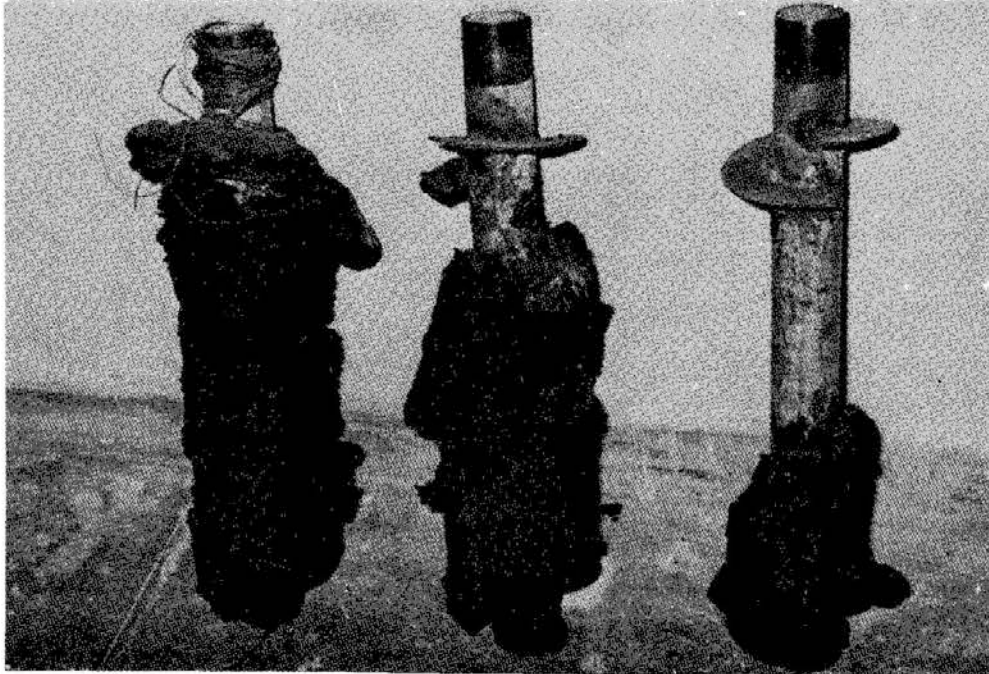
Photograph of pulled out piles after Pull-out tests (Set II, Soil 1)
